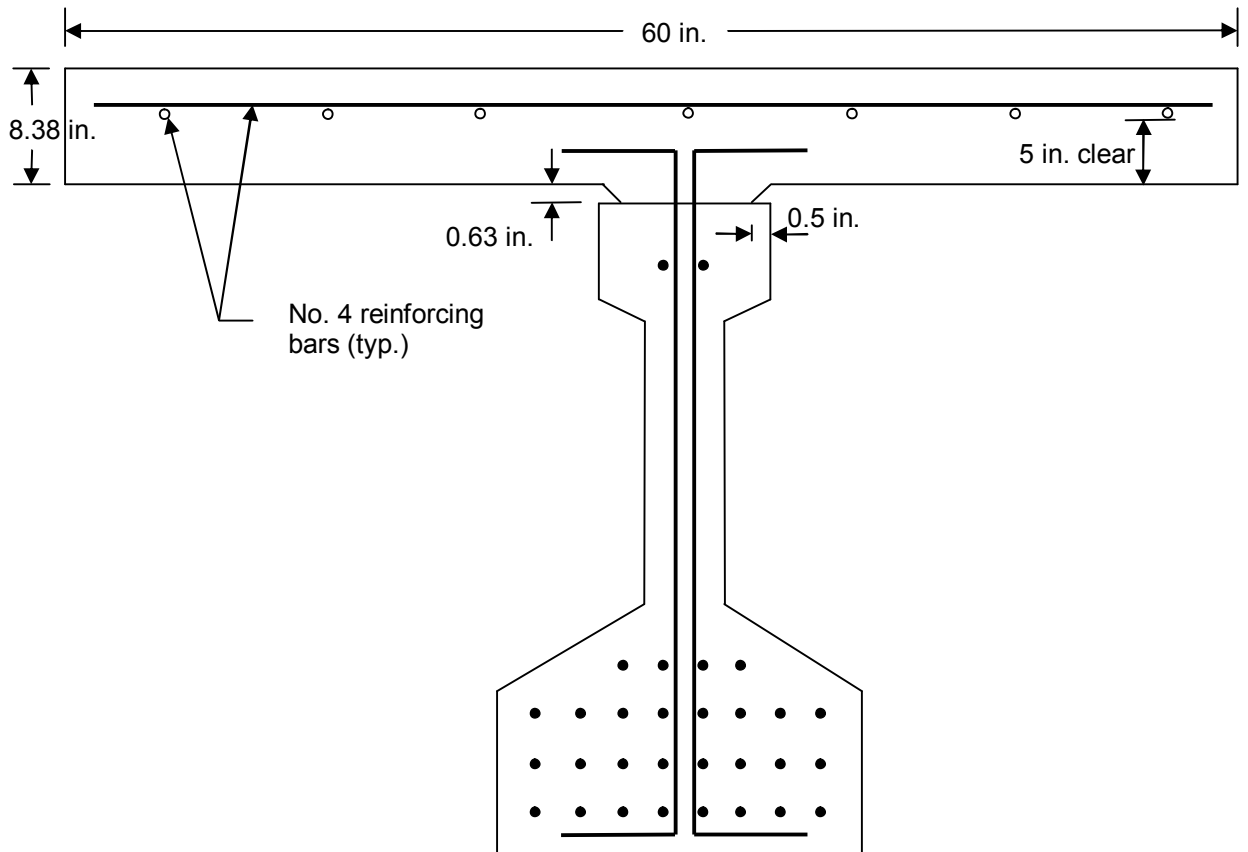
Cross-section of girder 3 with cast-in-place deck.
